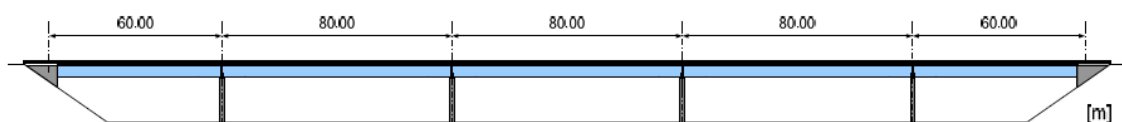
Elevation of the bridge deck and span distributions (source: OPTIBRI [5]).
